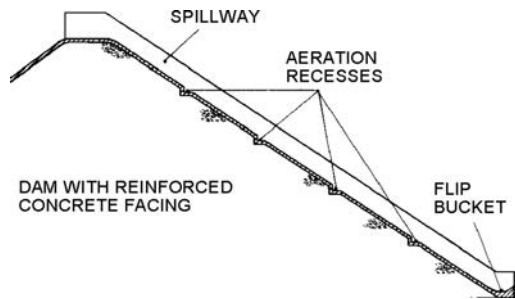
Spillway over embankment dam with reinforced concrete facing (cross-section).
